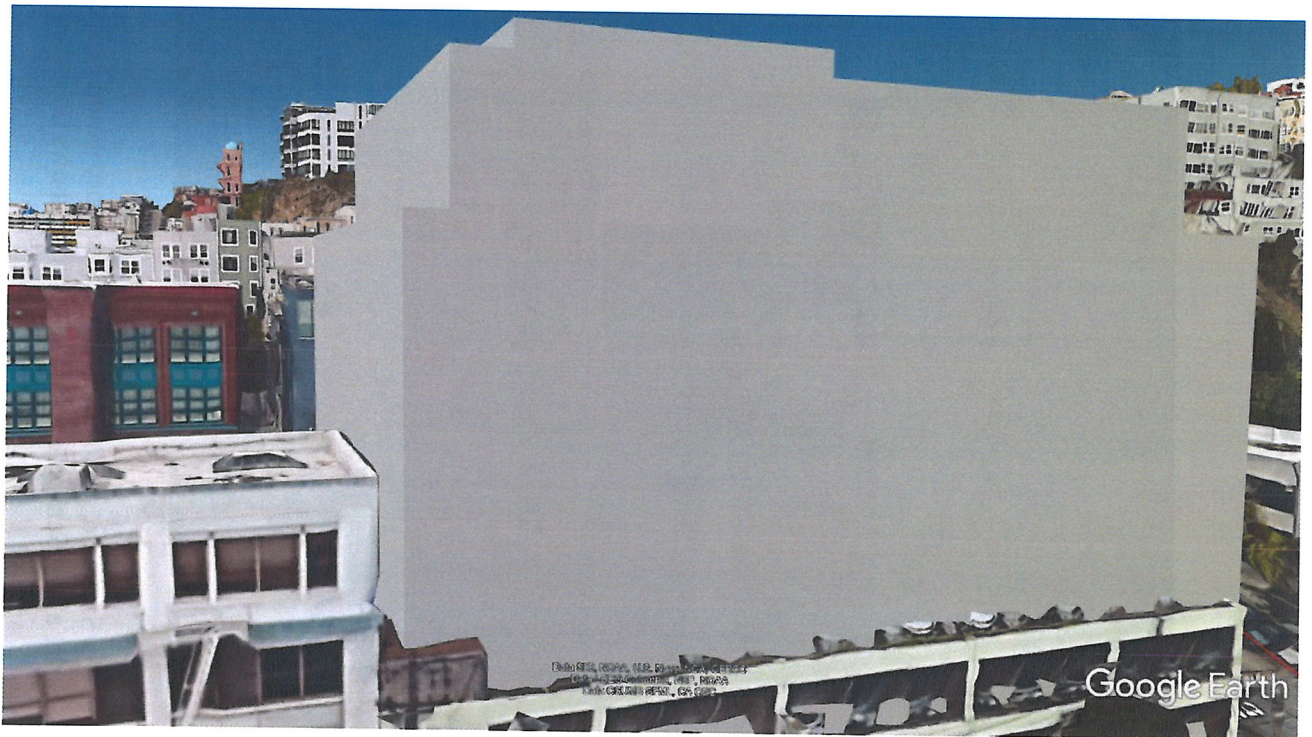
955 Sansome would be significantly taller and more massive than adjoining buildings (obtained from developer's section rendering).
